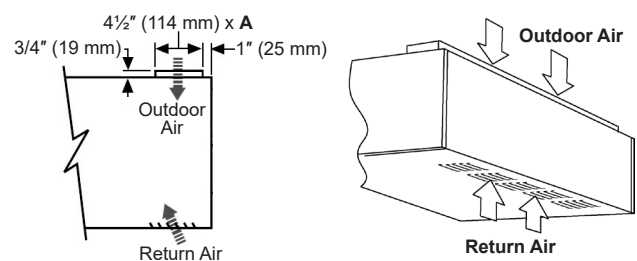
Arrangement 27 Return Air Bottom Grille/Outdoor Air Rear Duct Collar
